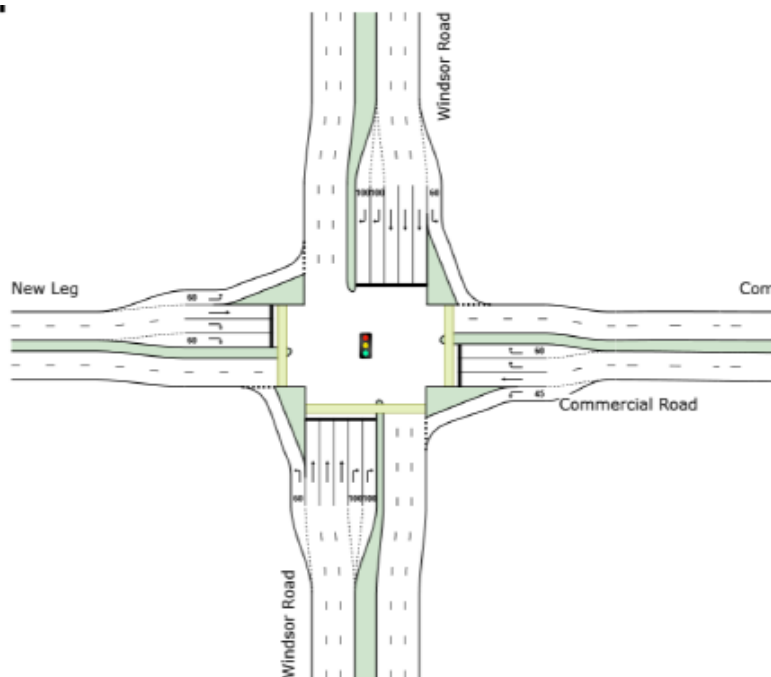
SIDRA Intersection Layout of Windsor Road and Commercial Road (source: Arup's traffic report)
